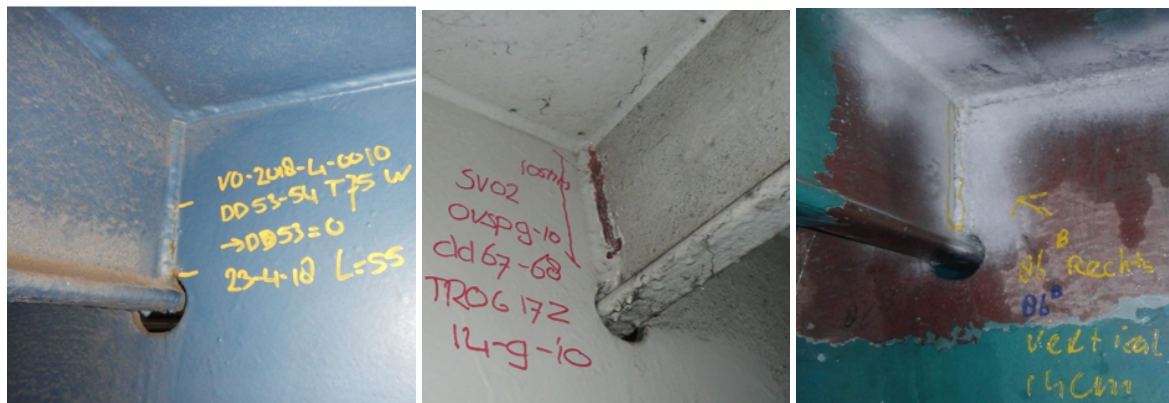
Fatigue cracks at intersection between longitudinal open stiffeners and crossbeams (Picture: Rijkswaterstaat)
